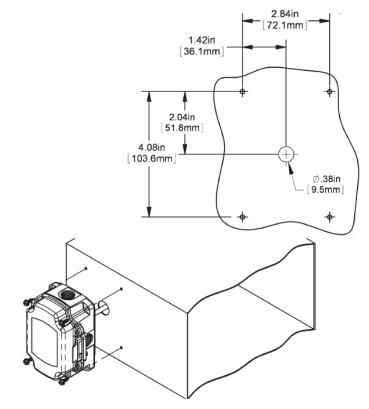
BBox (BB) Enclosure Mounting and installation Holes (Rotate 90° for Horizontal Mounting)
